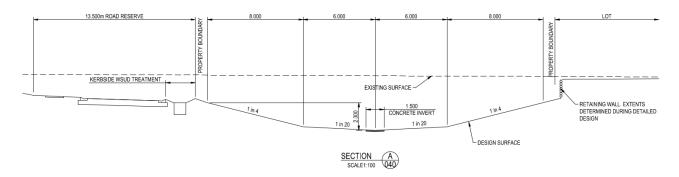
OPEN CHANNEL TYPICAL SECTION
